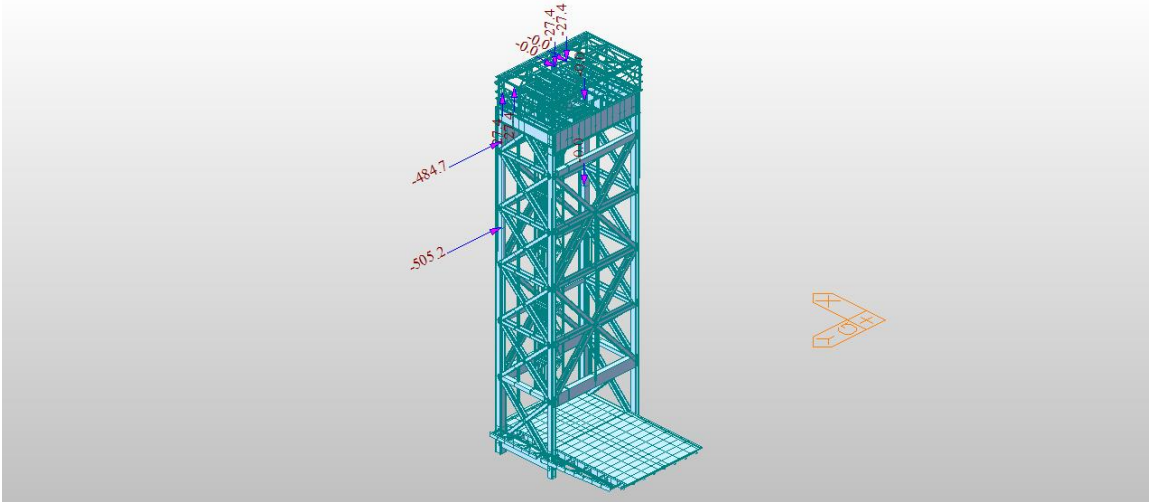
Wind Load Horizontal 2 (West to East) - Bridge
